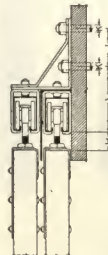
Cross-Section showing side wall bracket attachment with weatherstrip, of two parallel sliding doors.
